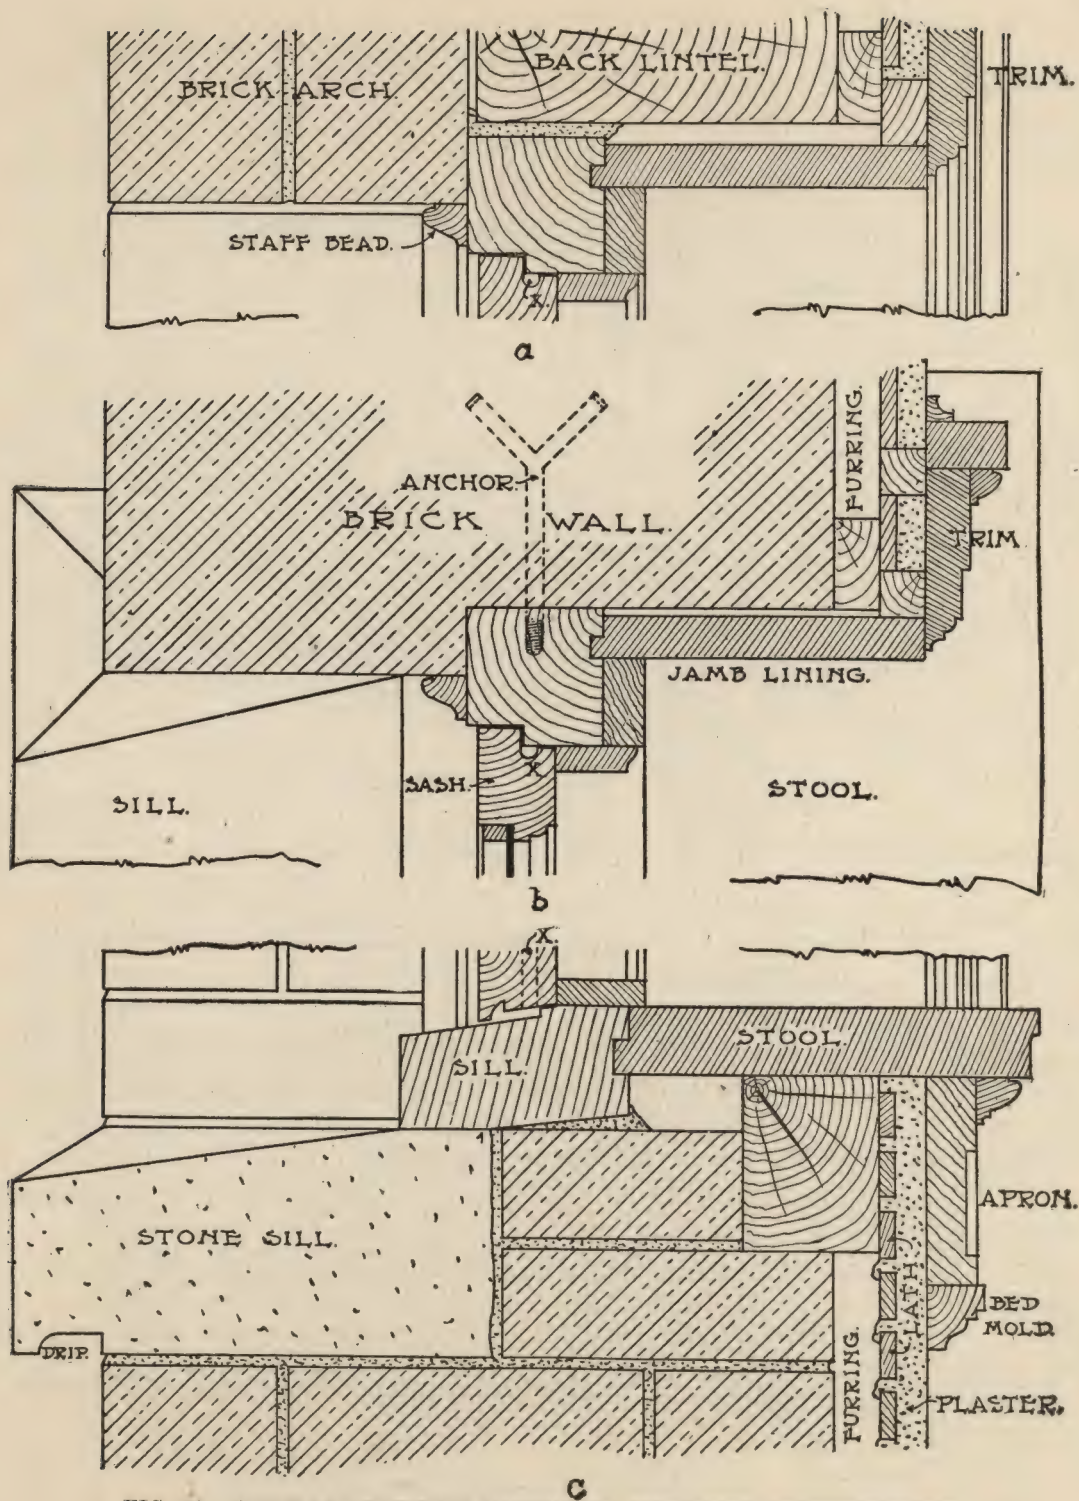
OUTWARD-OPENING CASEMENT, IMPROVED CONSTRUCTION.
